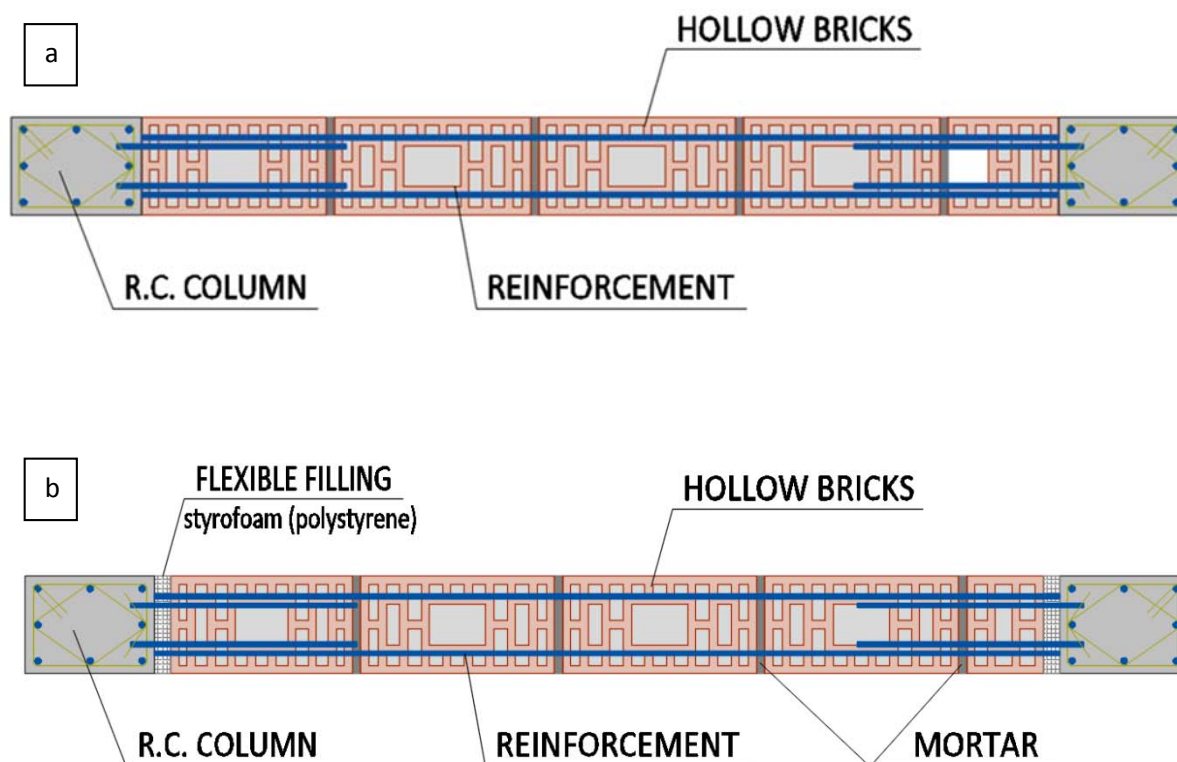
Masonry infill configuration and layout of proposed connection of Model IW-SB a) variant solution –without vertical gap b) variant solution with vertical gap filled by flexible filling
